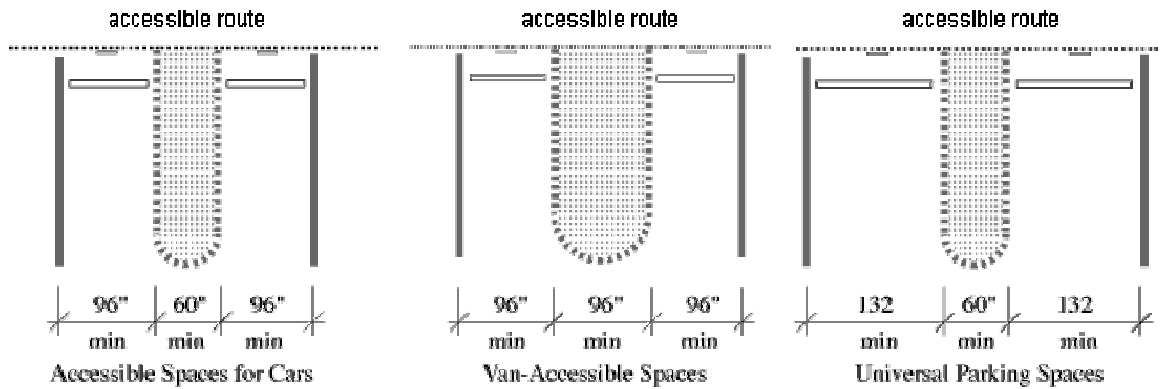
Accessible Space and Access Aisle Quick-Fix
